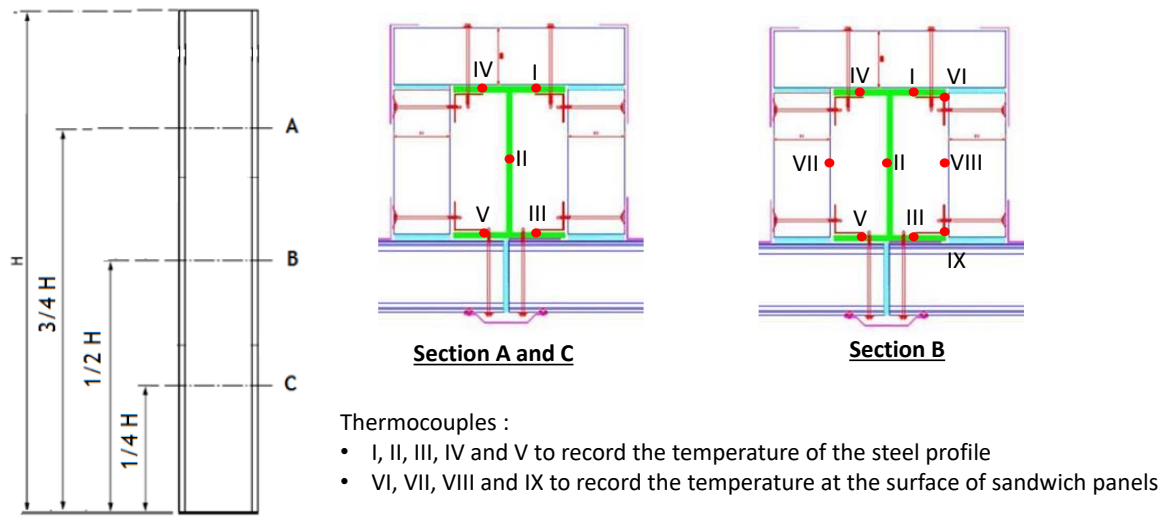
Thermocouple positions along steel members encased with sandwich panels
